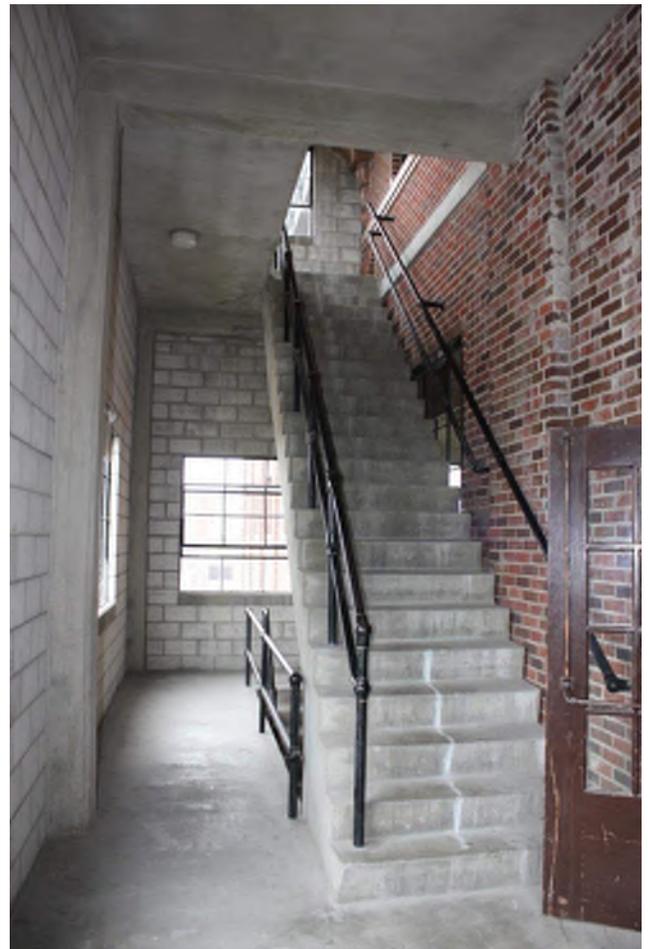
The south stairway is of exposed concrete structure. The walls were infilled c. 1945.
